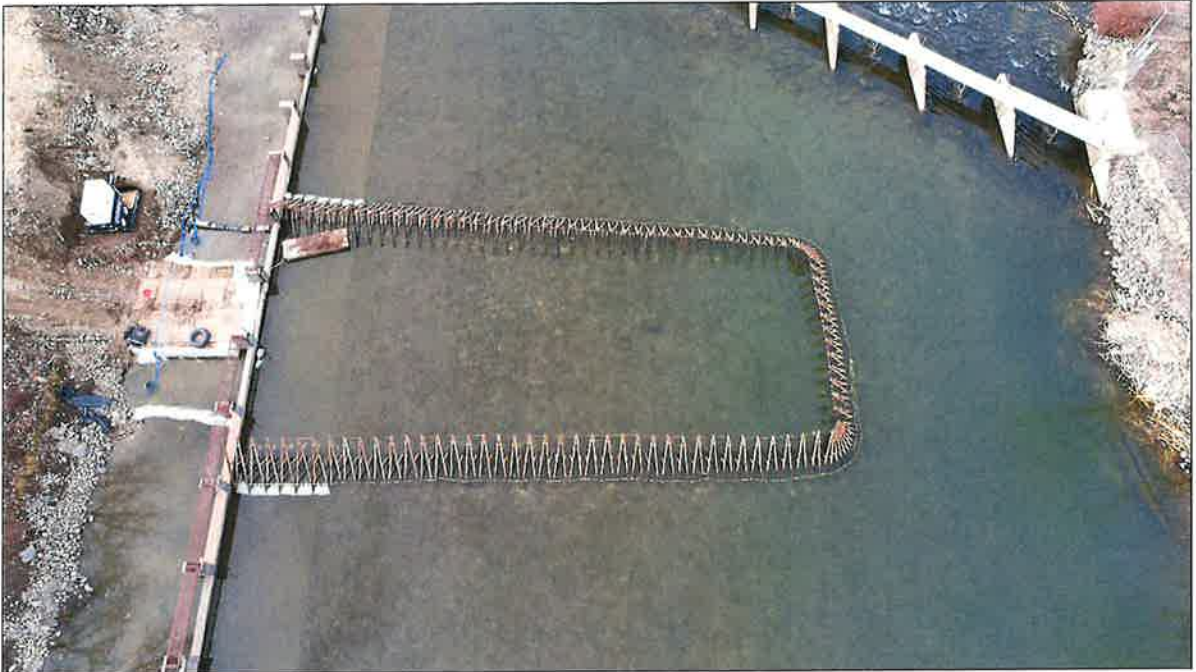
(February 2025). Existing radial gates (to remain in place) and Geotech dewatering into Ridenbaugh Canal (similar to Proposed Action dewatering).
